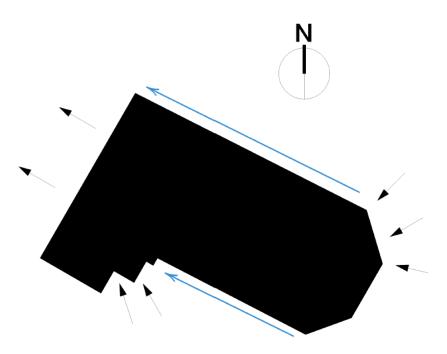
Drainage plan with ditches shown in blue, arrows show direction of ground slope
